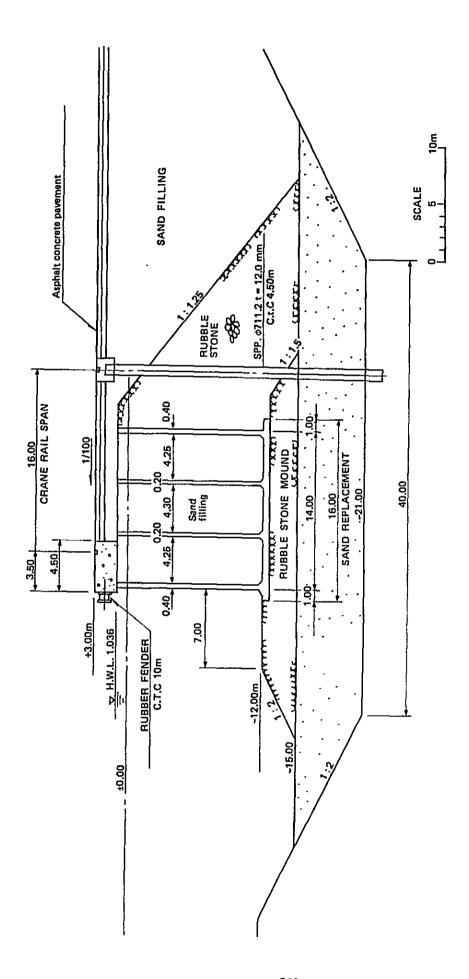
Container Berth Quaywall (Concrete Caisson Type)
